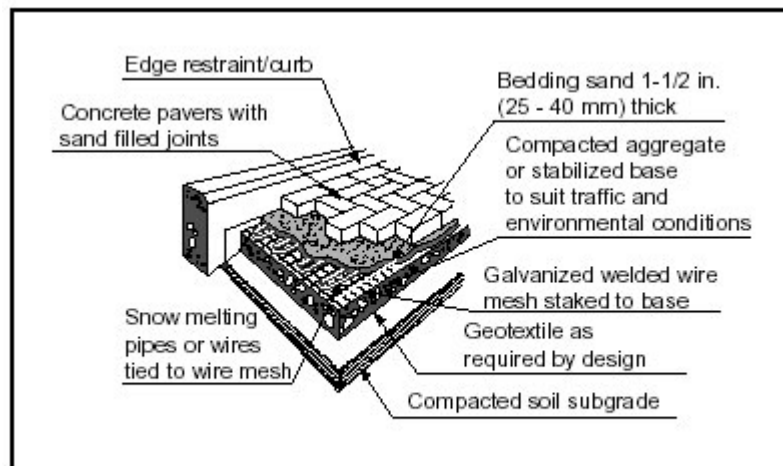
Typical components of a snow melting system for interlocking concrete pavements.
